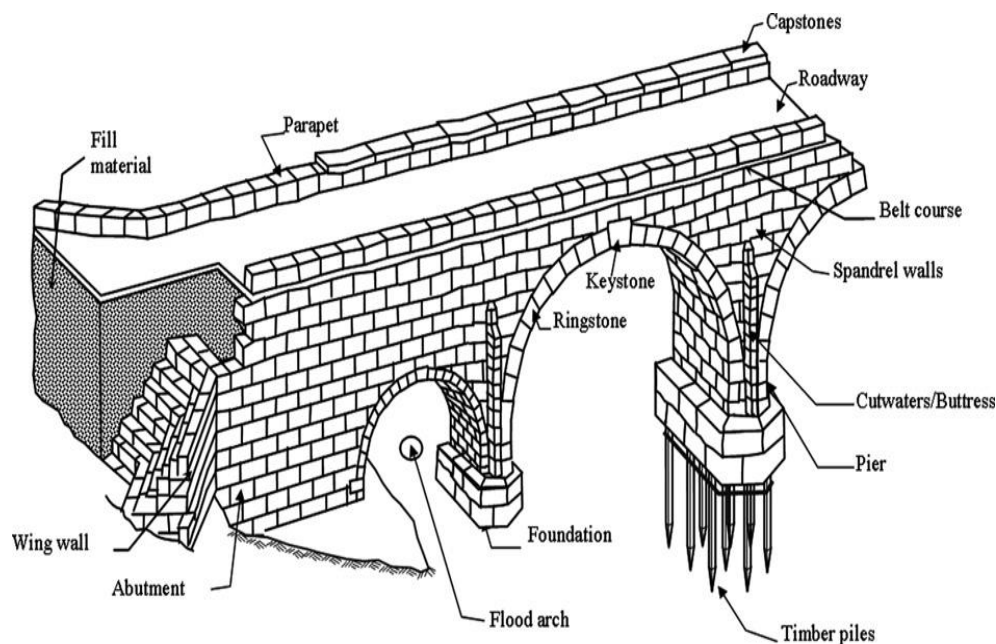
Main components of a masonry arch bridge (Ural et al. 2008)
